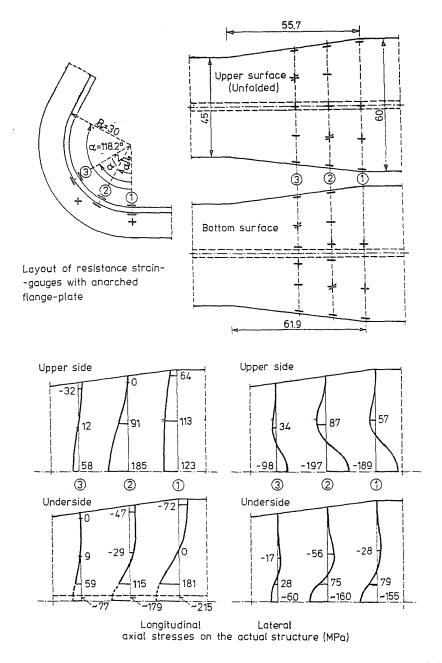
Summary of the results gained by model experiments for testing one of the joints of the planned railway bridge at Simontornya having a layout similar to that of the bridge at Bánréve
